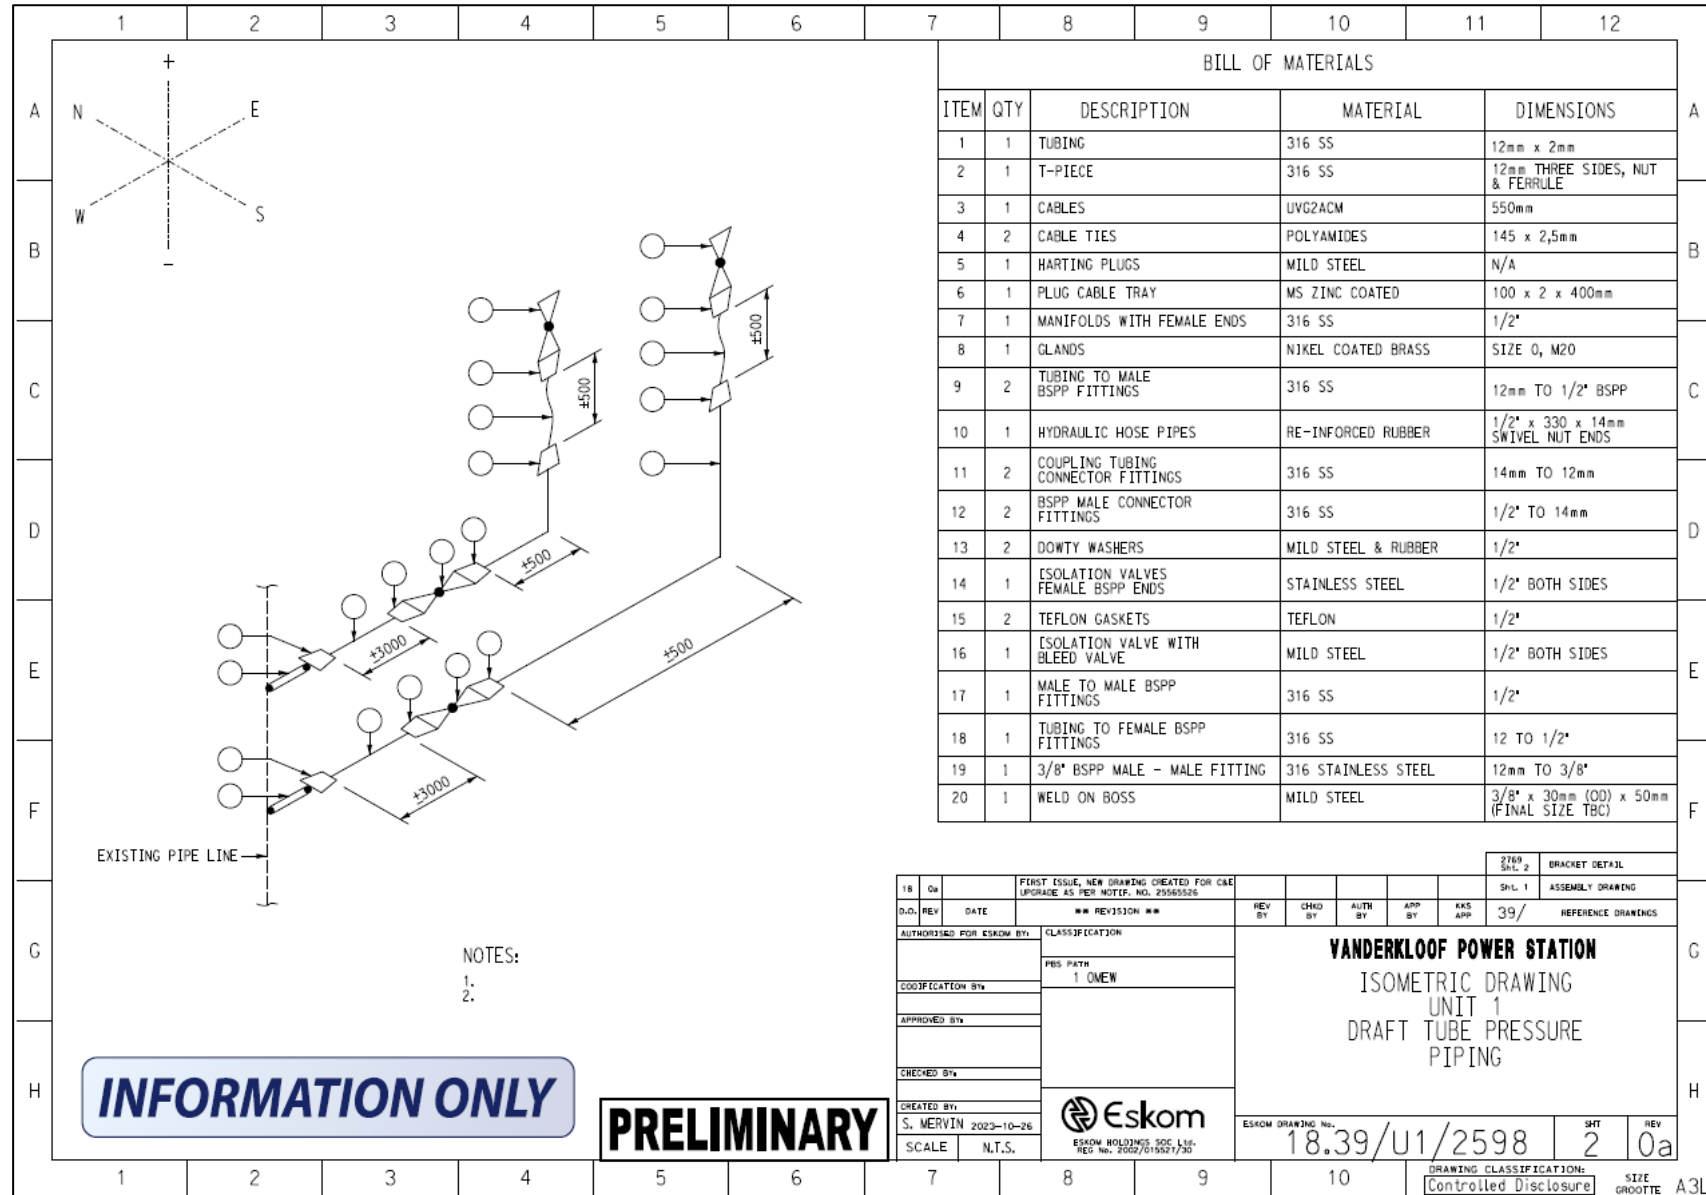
Isometric Drawing Single Pressure Transmitter and Gauge piping
